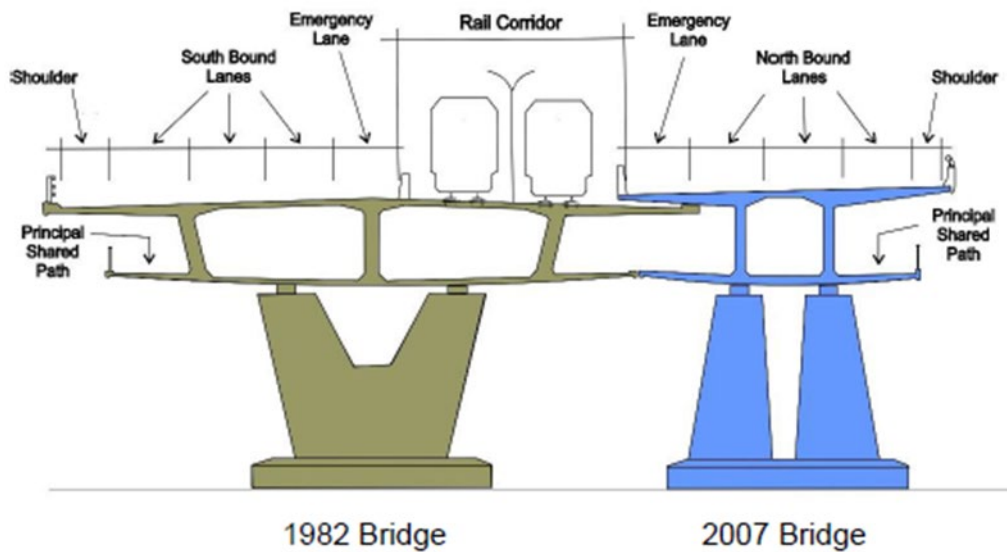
Cross section of *Mount Henry Bridge*, showing the juxtaposition of the new and original structures, and the addition of the railway lines. Mt Henry Bridge – Engineering Heritage Marker Award Ceremony Program 2024, p.4.
